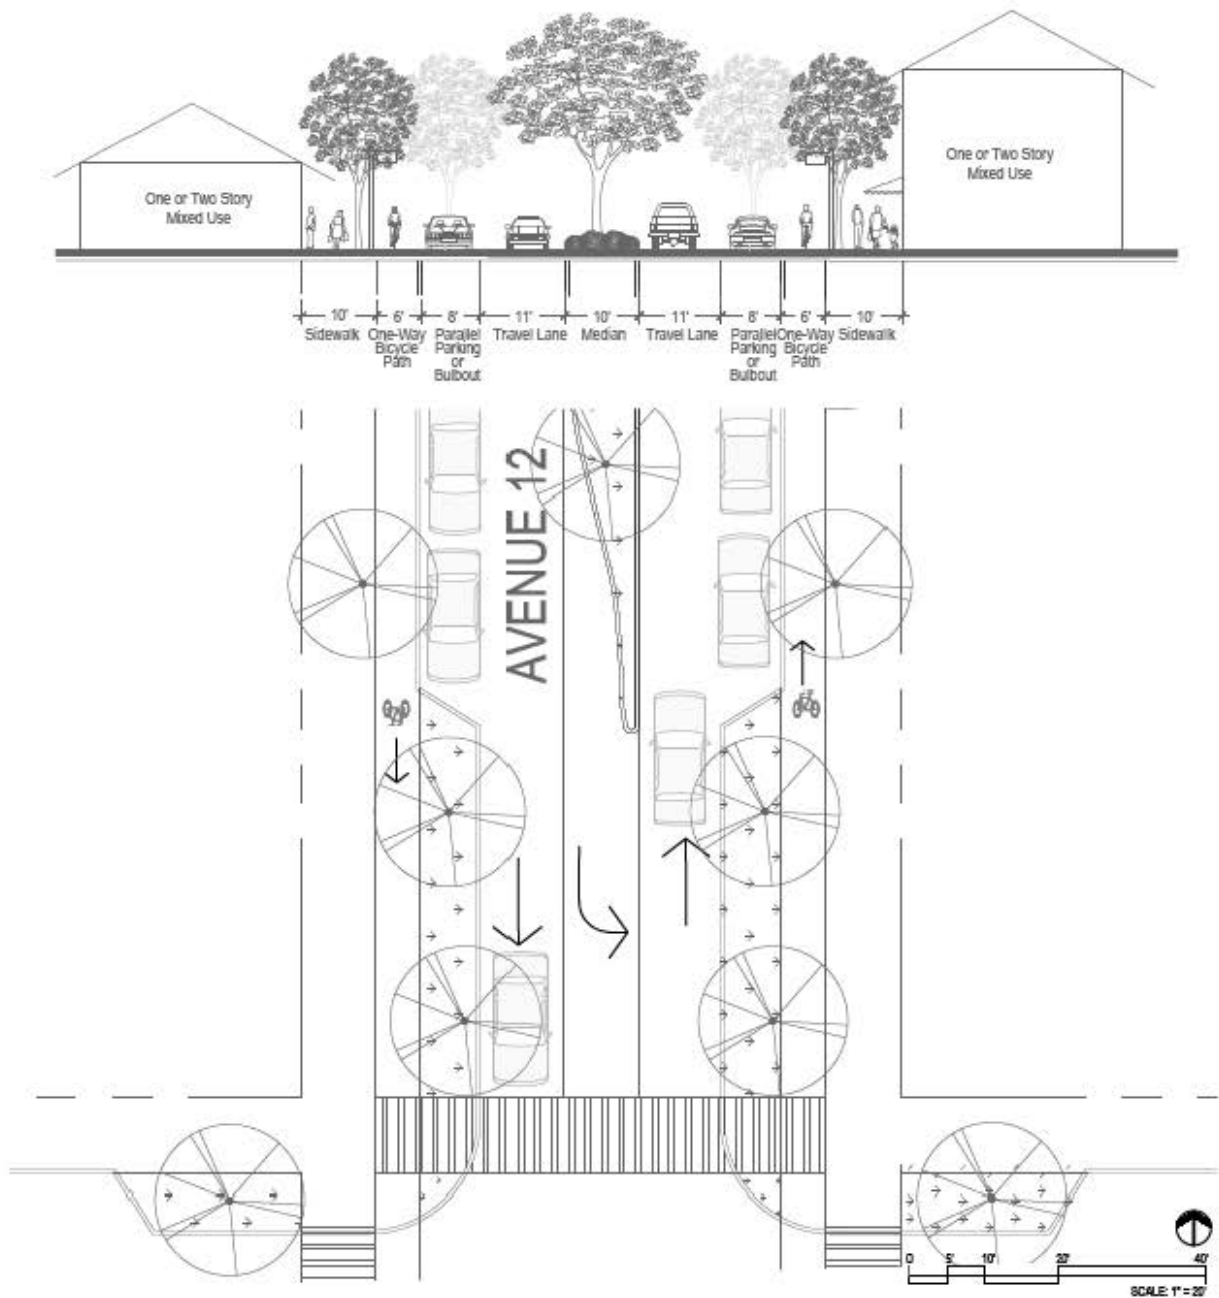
Avenue 12 Cross-Section near Downtown Area
